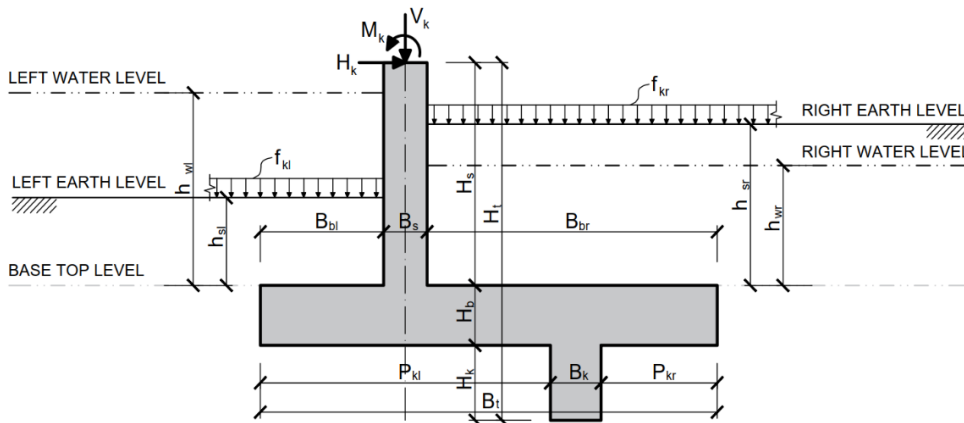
Analyzed structure of a retaining wall - geometry and loading.
